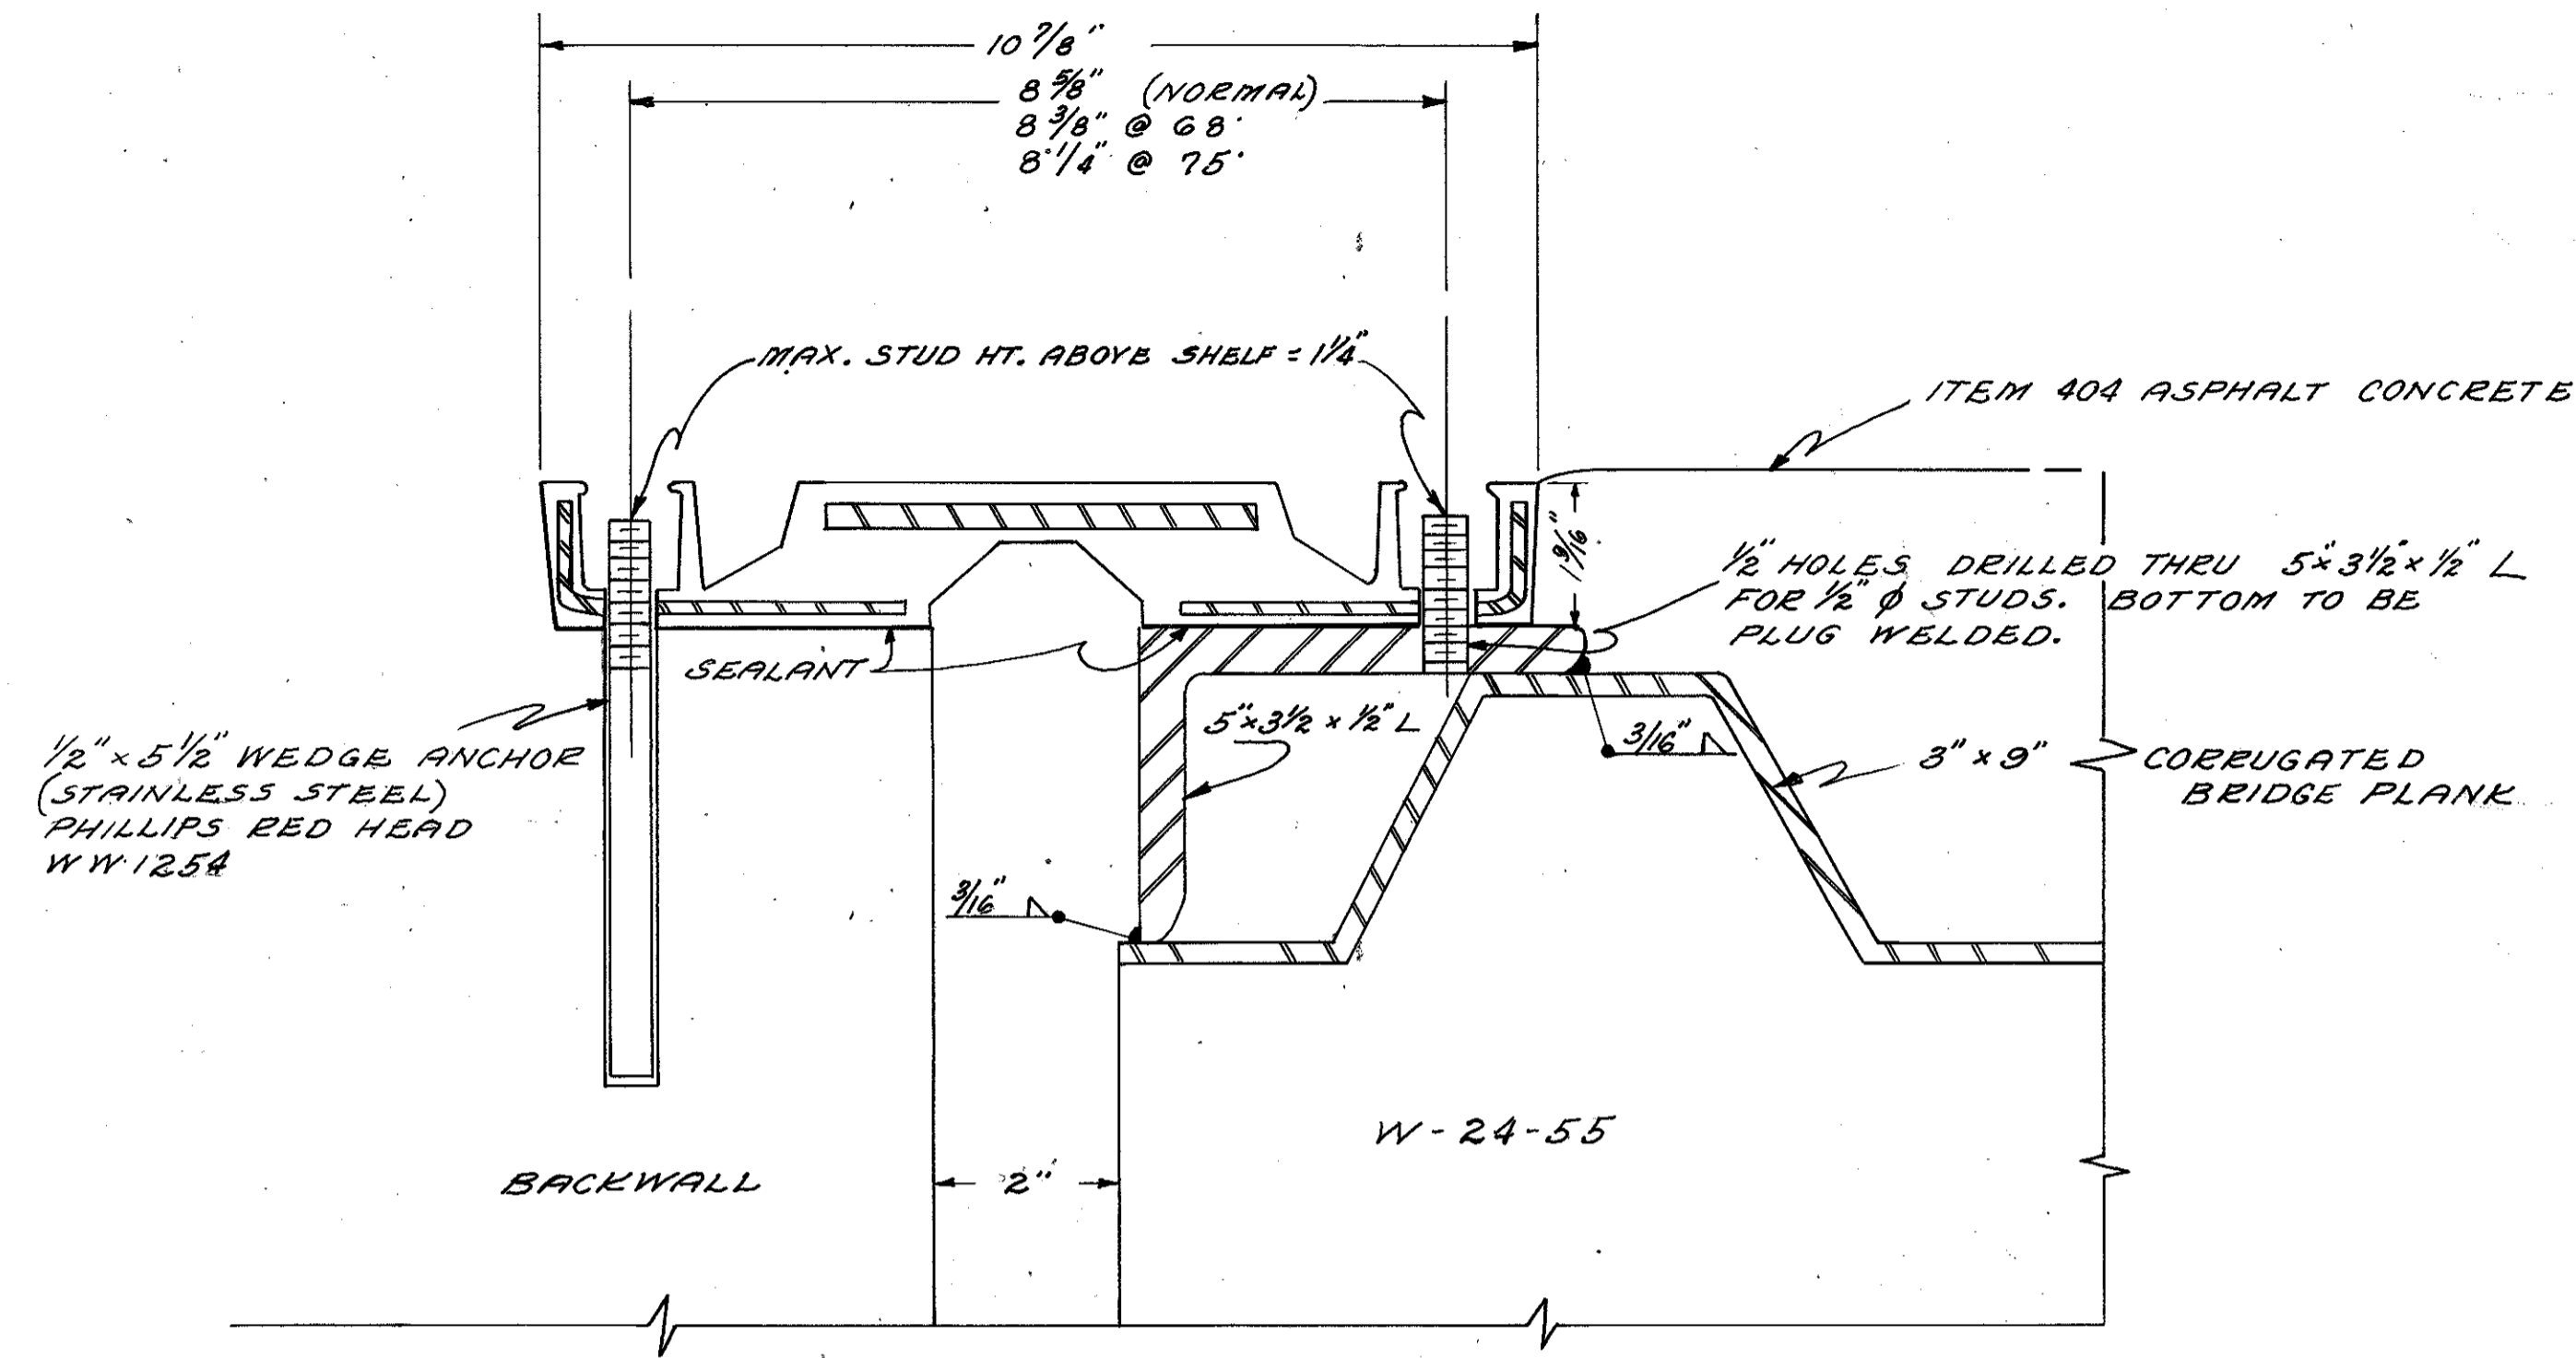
DETAIL - STRINGER BEARINGS ON ABUTMENTS
